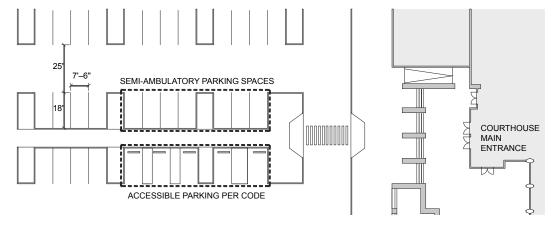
Parking Layout Showing Location of Accessible and Semiambulatory Spaces
